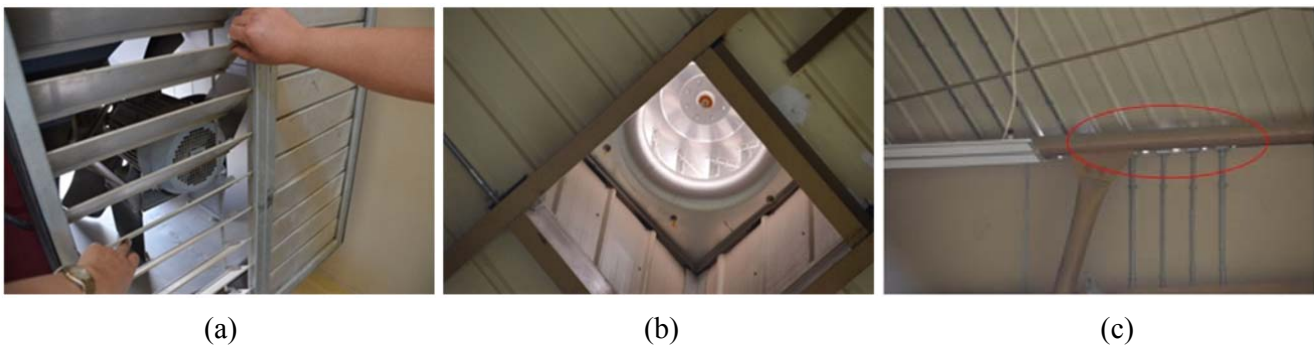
Various leakage locations in the winery building: (a) emergency ventilator with a poor-quality damper, (b) roof ventilator cap without a damper, and (c) small leaks between the roof and wall.
